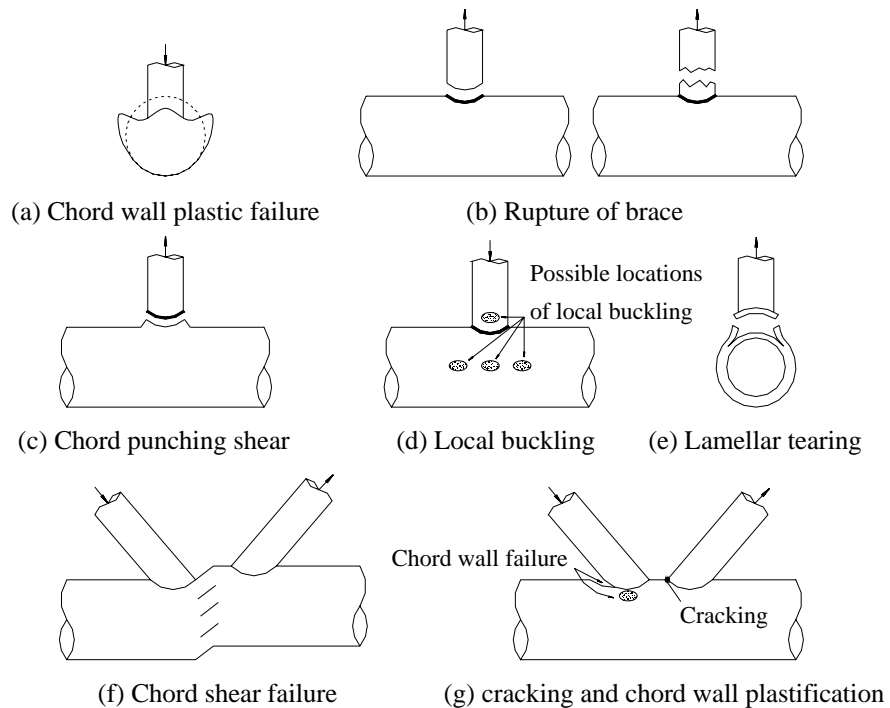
Typical failure modes of simple welded tubular joints
